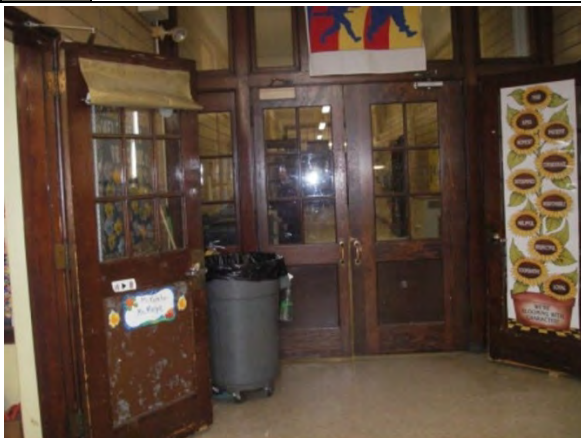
HALLWAY METAL DOUBLE DOORS PAINTED TO LOOK LIKE WOOD
